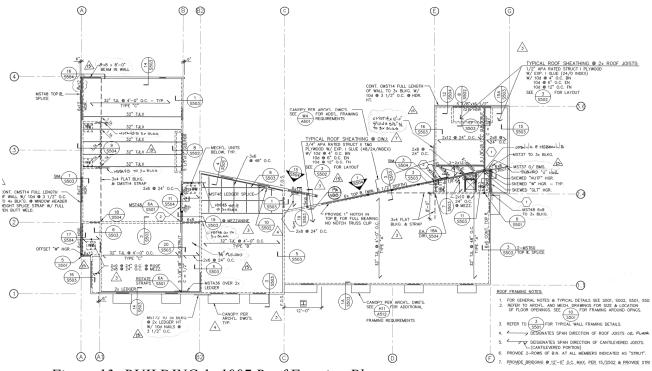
BUILDING 1: 1997 Roof Framing Plan
